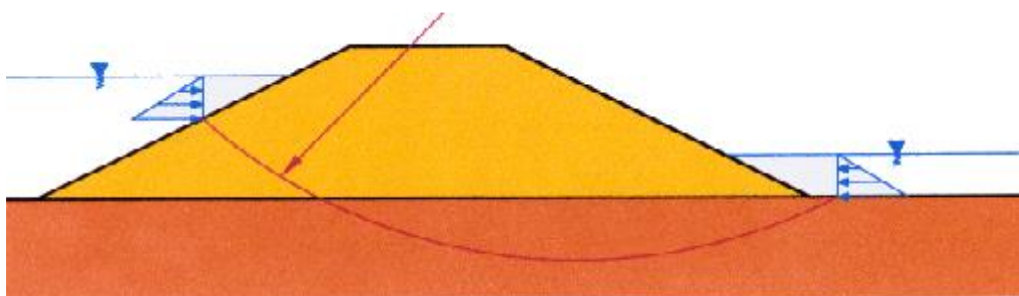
Hydrostatic pressure of external water at the exit points of the failure surface [32]
